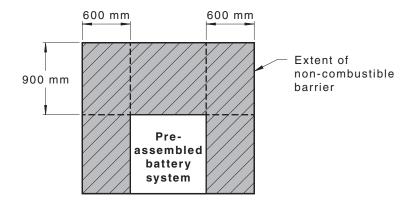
Barrier zones for pre-assembled battery systems installed on or near a habitable room facing wall
